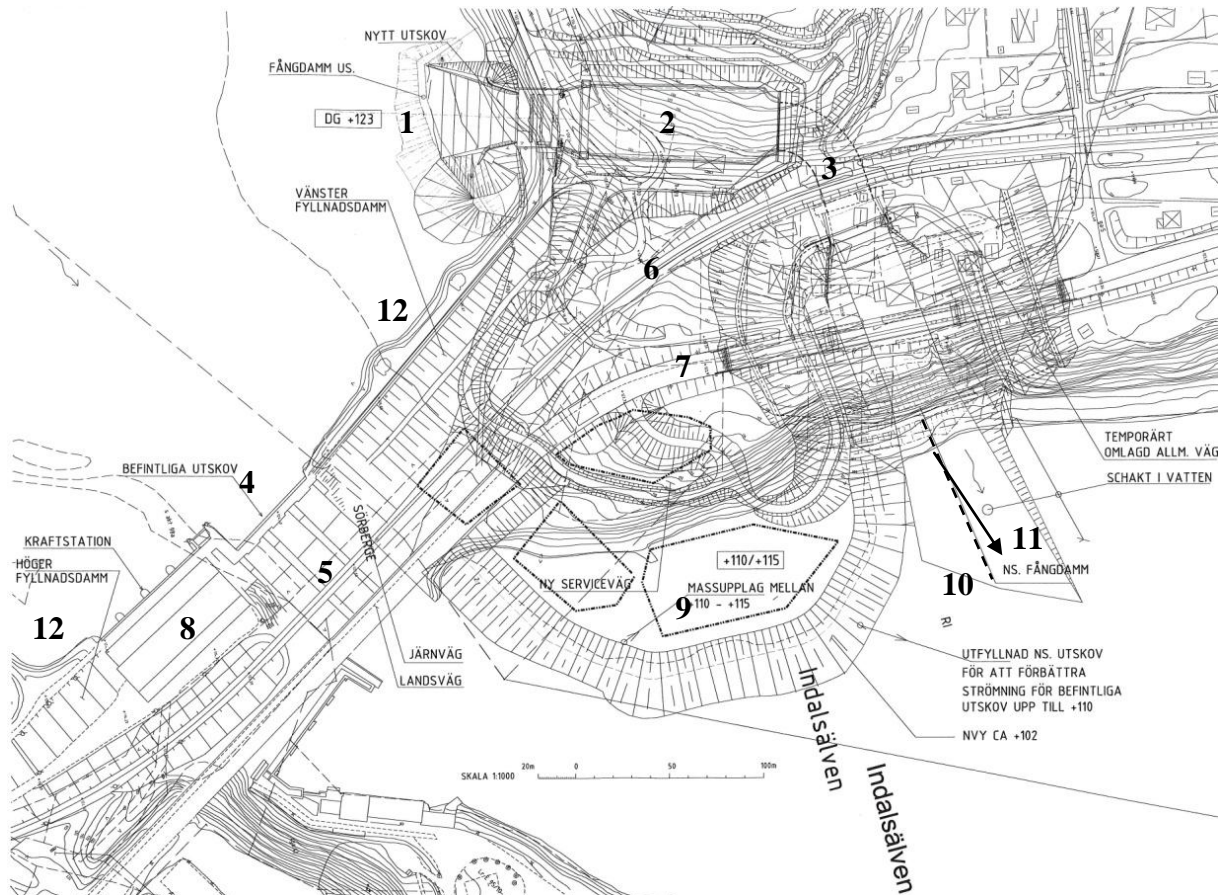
Layout of the new spillway (Ekström et al., 2011).
